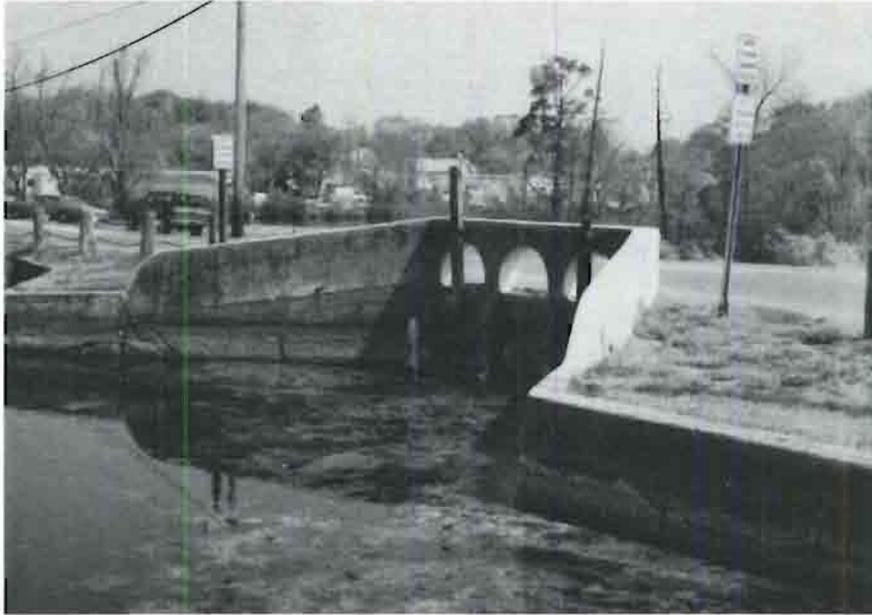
Penstock bridge, looking northeast, detail of upstream structure
